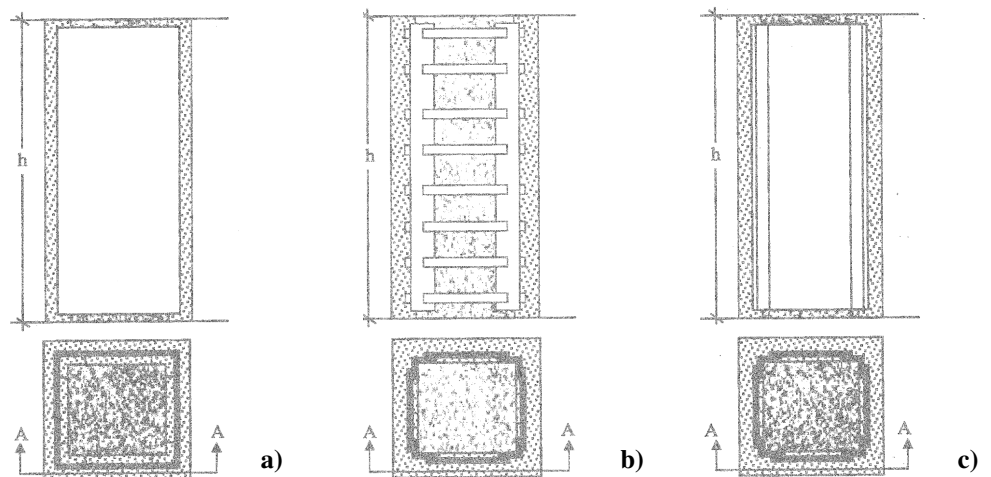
Repairation of columns: steel jacketing (a) and steel cage technique using steel straps (b) or steel plates (c)
